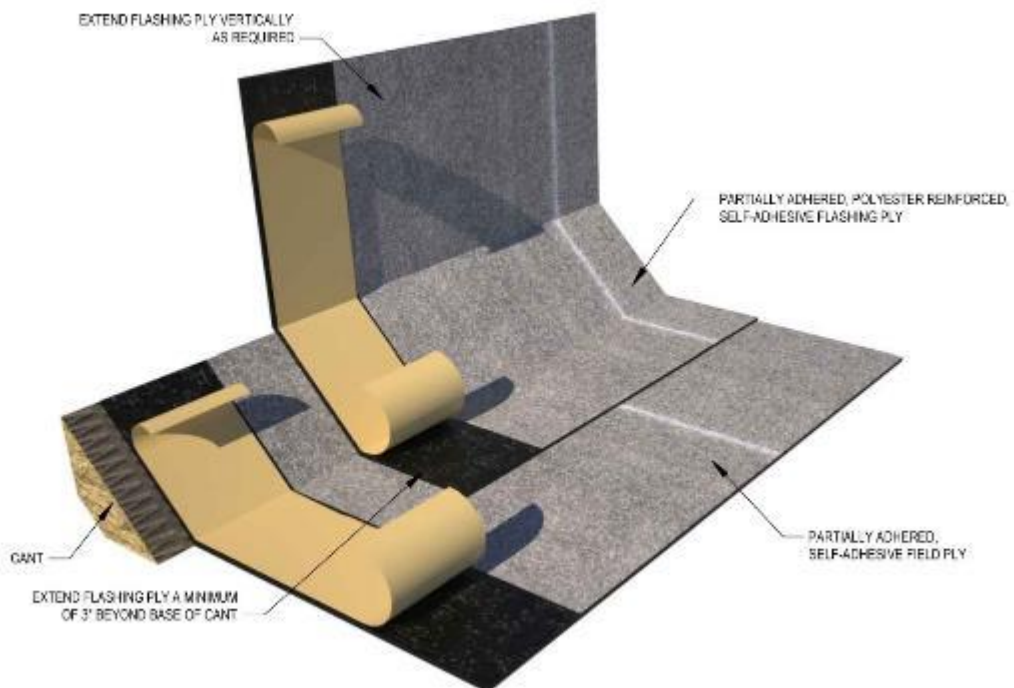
Partially Adhered, Self-Adhesive Vapor Retarder Flashing at Wall/Curb With Cant
